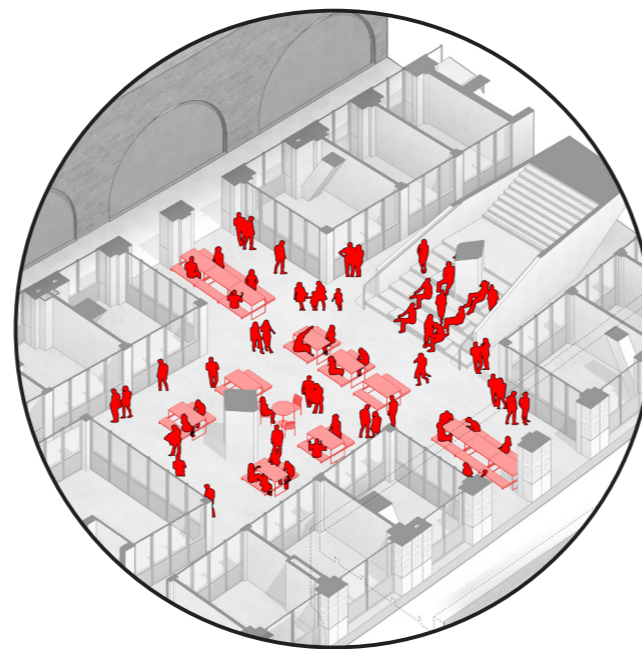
Publicly Accessible Open Space first floor axonometric diagram
